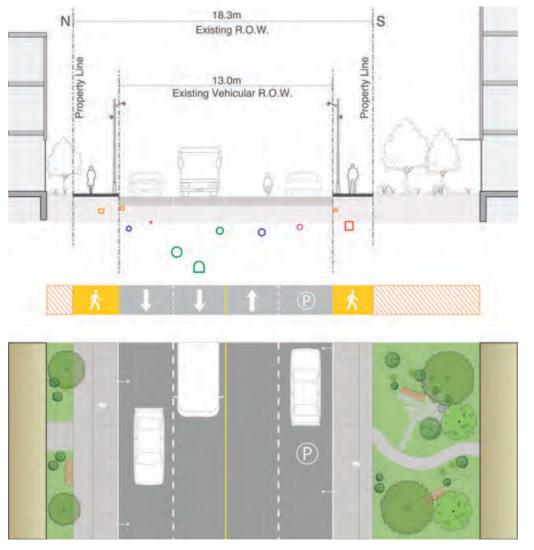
Section and Plan of the Existing Conditions along Davisville Avenue
